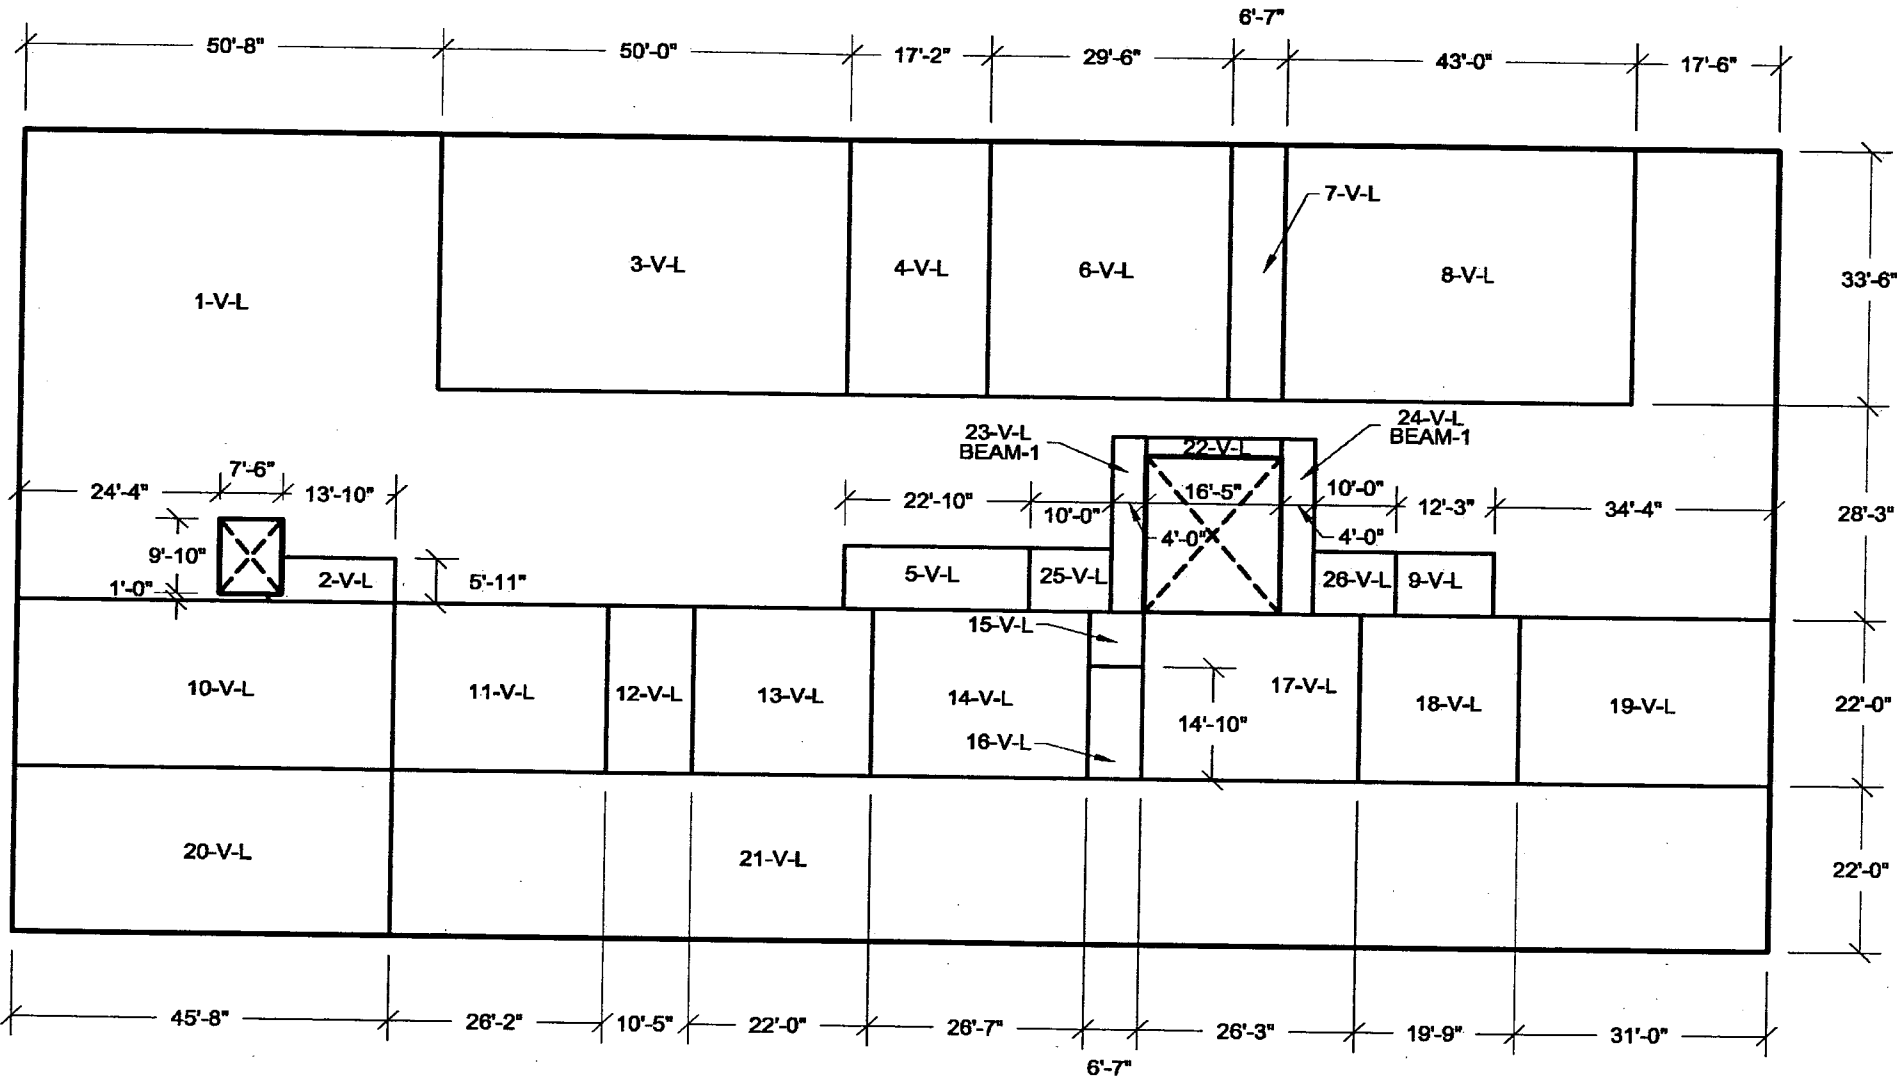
H.3-10: NORTH WALL LOOKING SOUTH
